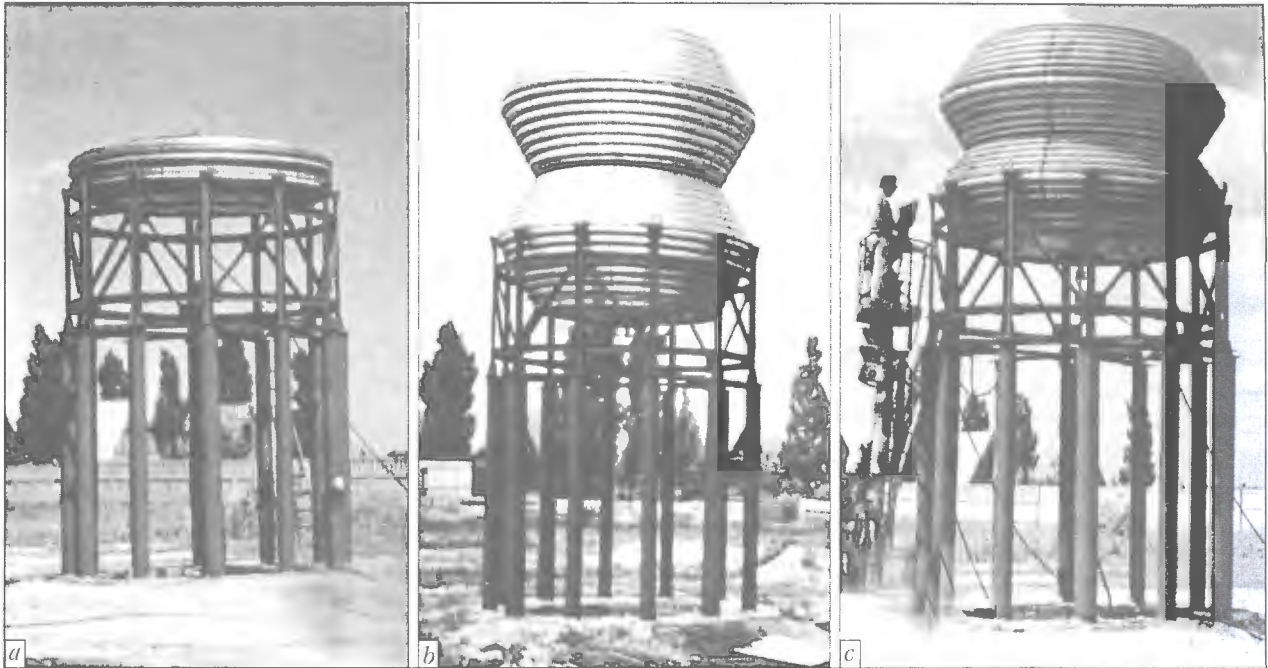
View of a large-sized welded structure of a transformable volume before (a) and during (b) deployment and after full deployment (c)
